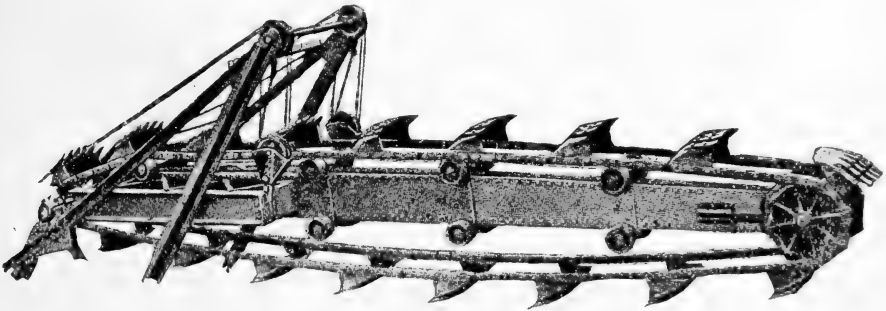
Endless Chain Excavator—Digging Apparatus (for larger machine than Fig. 9).
